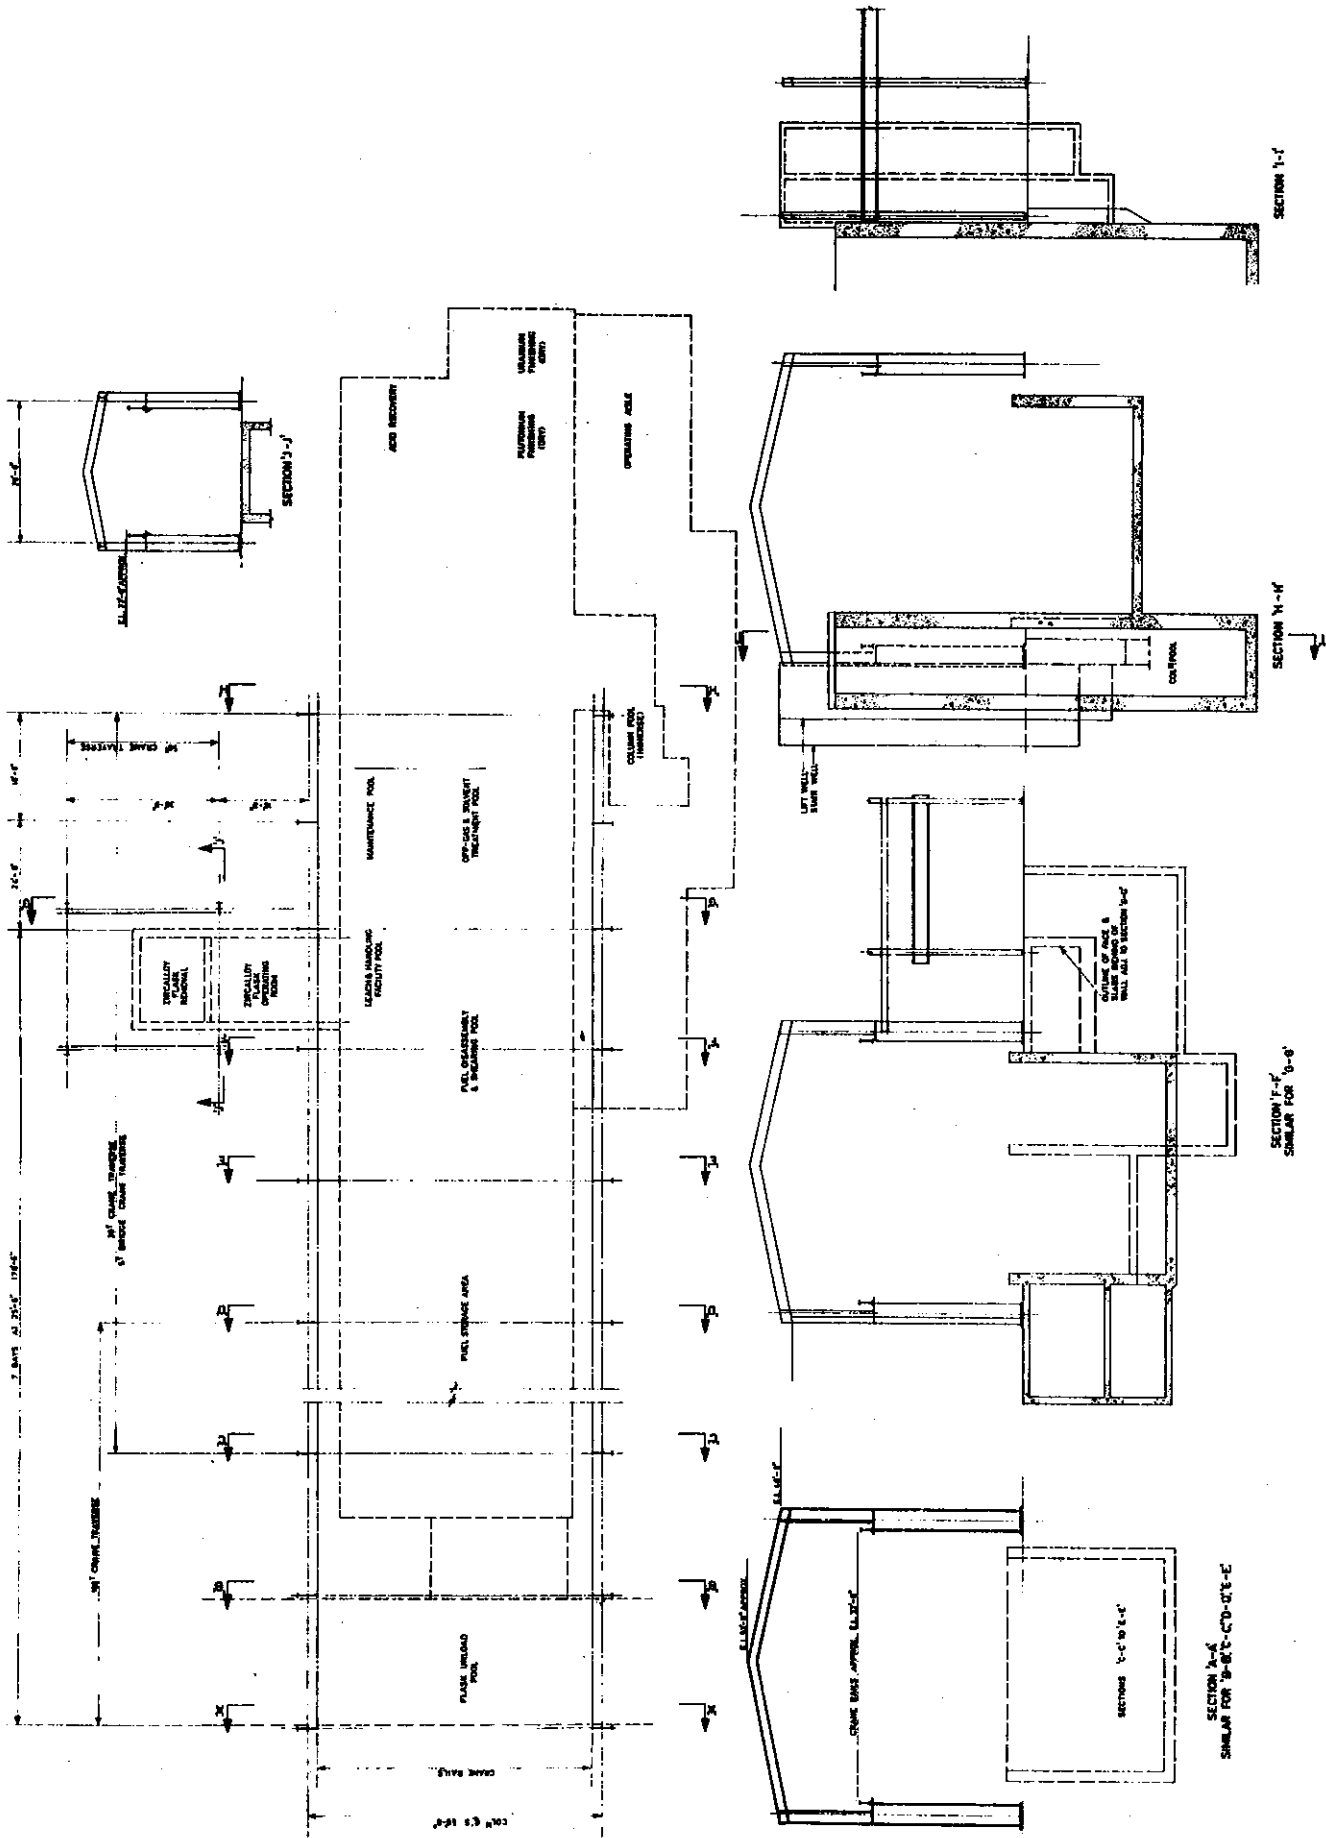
BUILDING LAYOUT - CRANE SUPPORTING BUILDING - SECTIONAL ELEVATION
